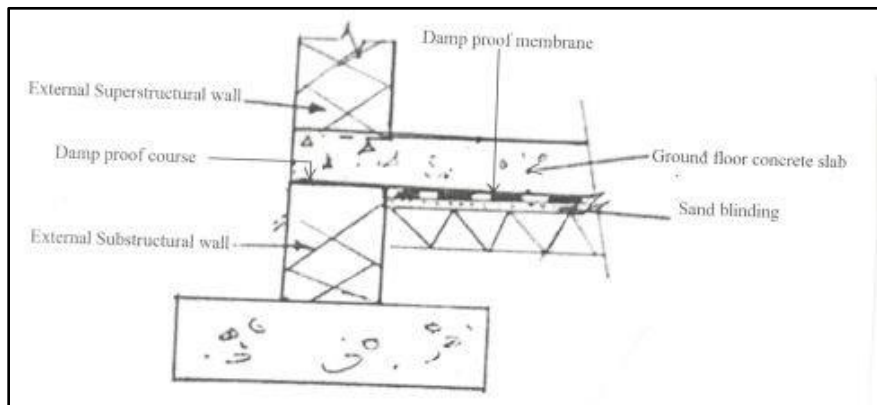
shows a section through a two-storey building on a moderately firm soil. The walls are built with sandcrete blocks. Use it to answer Question 1.
